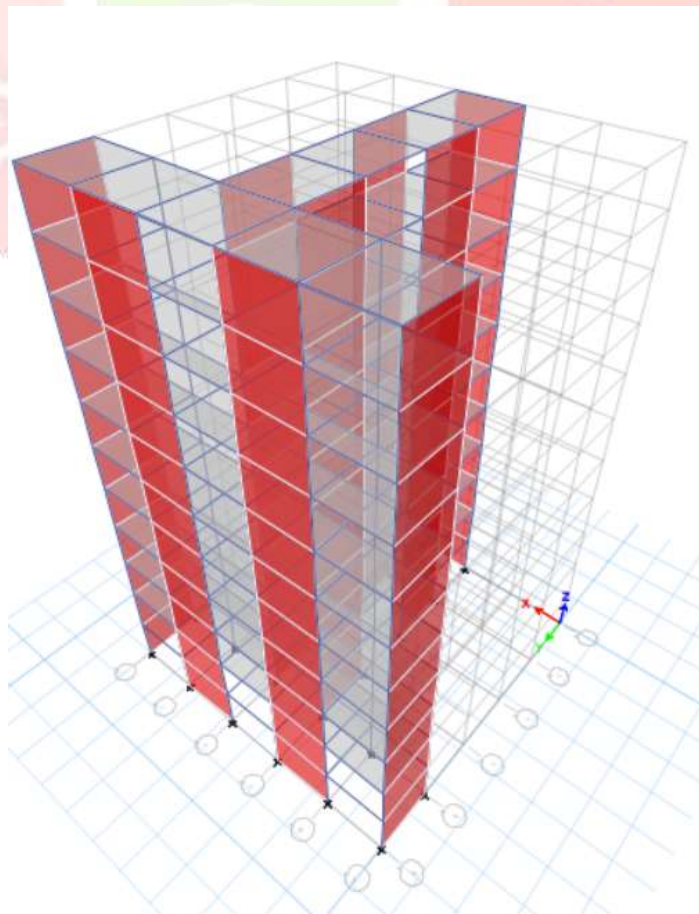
3D VIEW OF RCC COLUMN WITH SHEAR WALL BUILDING
